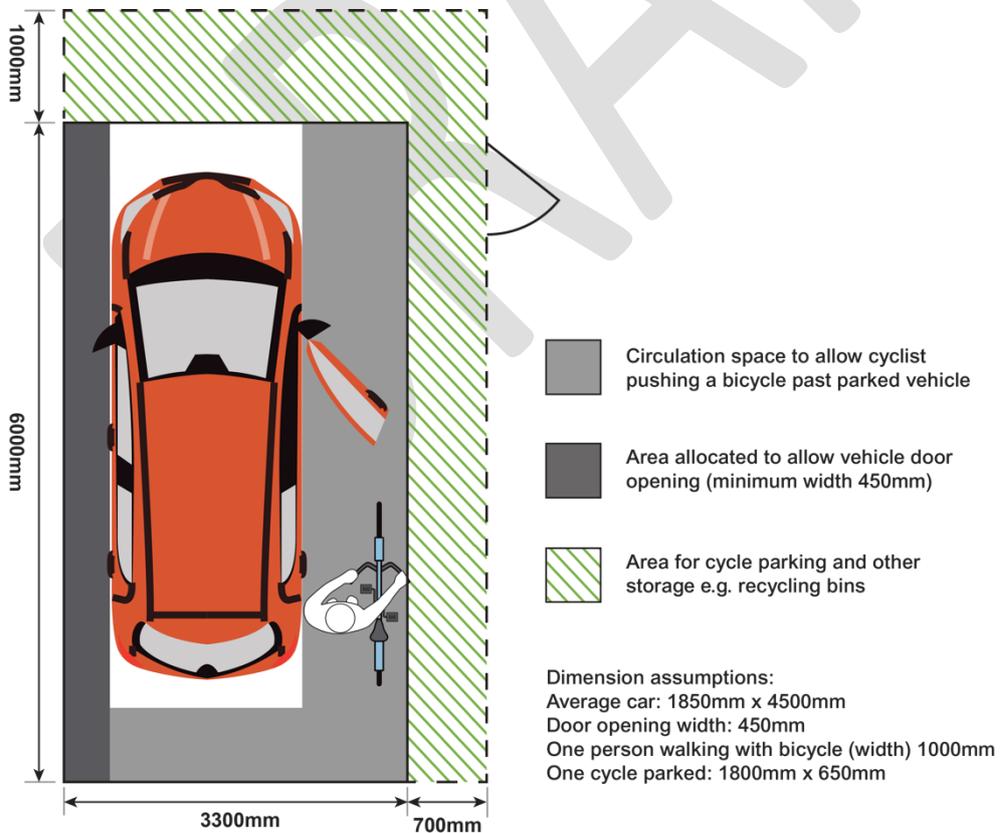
Minimum garage dimensions where parking for 4 cycles is also provided
